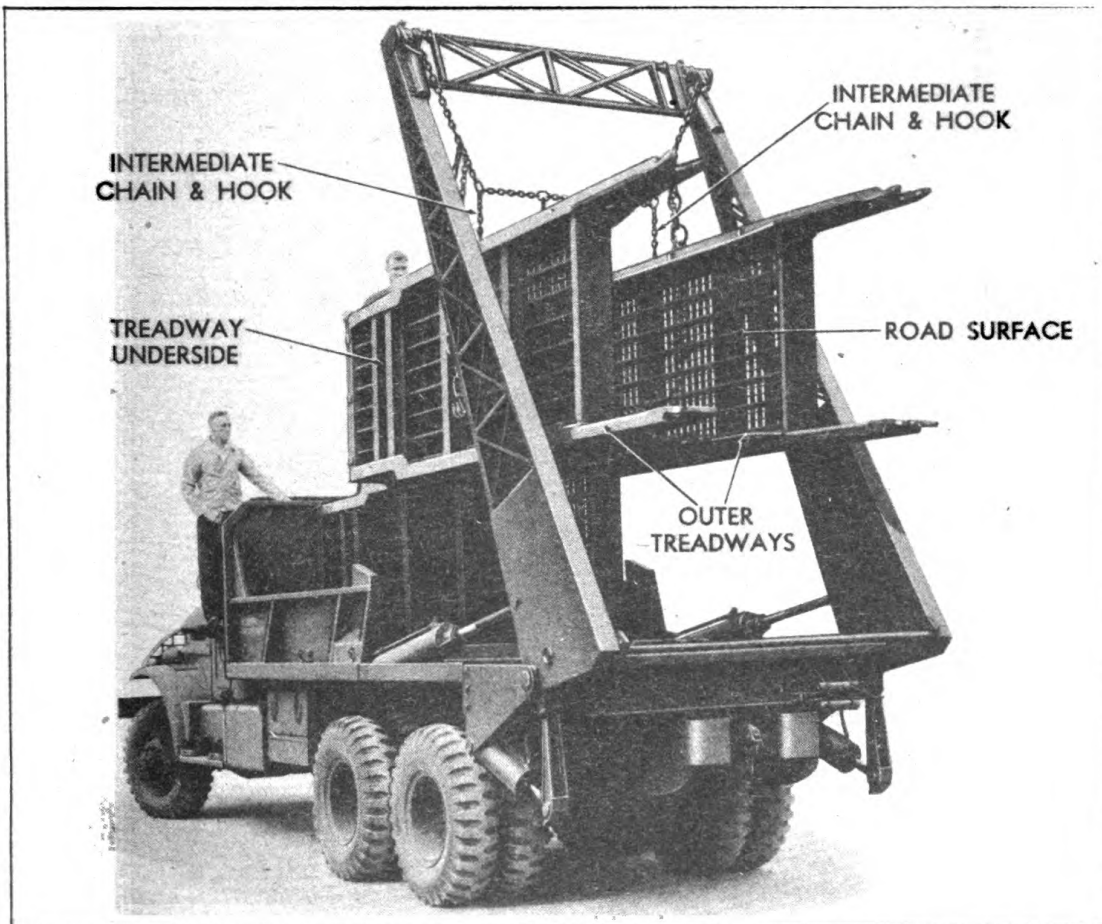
Hydraulic Bridge Erecting Crane in Operation
